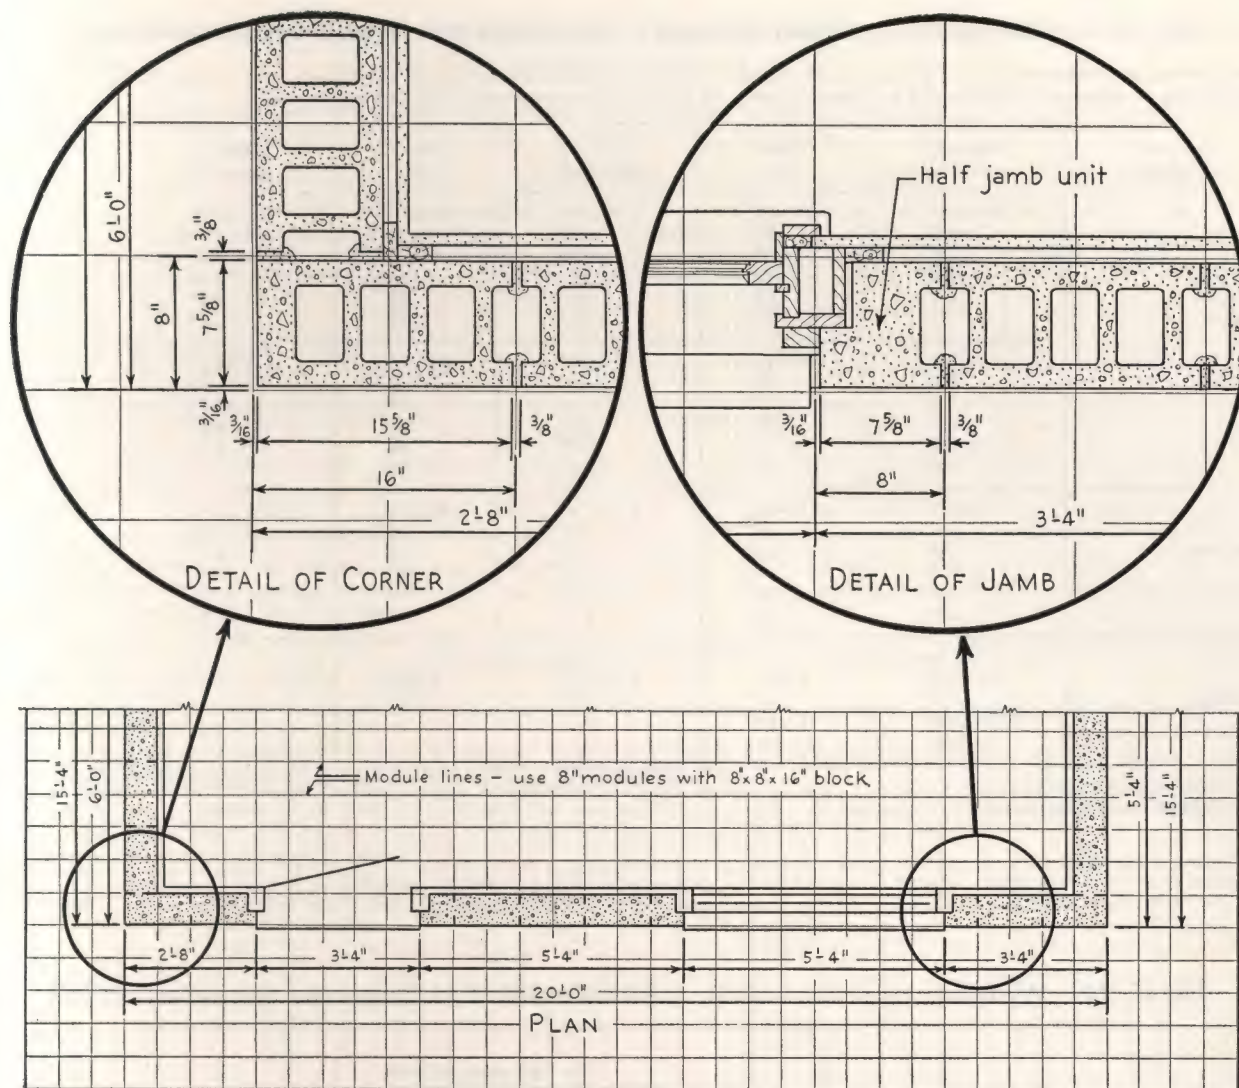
Showing how concrete masonry walls are dimensioned on drawings for modular planning using nominal dimensions. Enlarged details at corner and jamb (usually not shown on drawings) show how block are actually laid in the wall.
